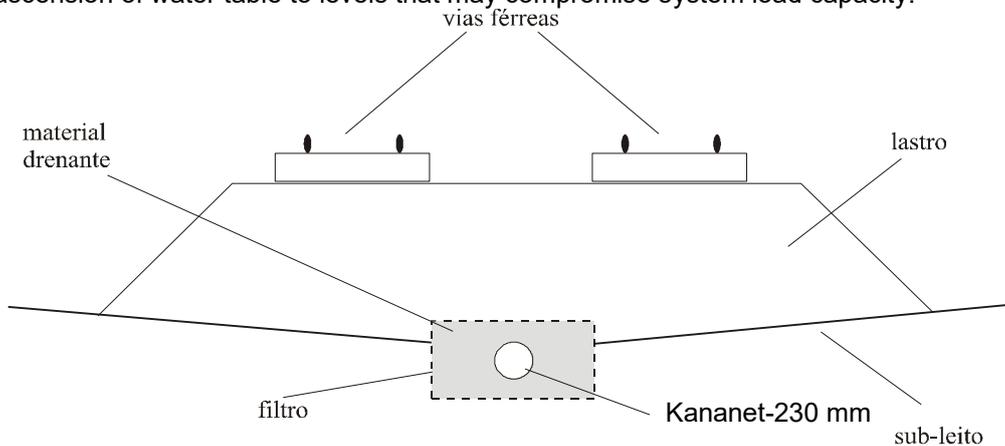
Longitudinal drainage trench for capturing local infiltration waters, positioned between the tracks.
